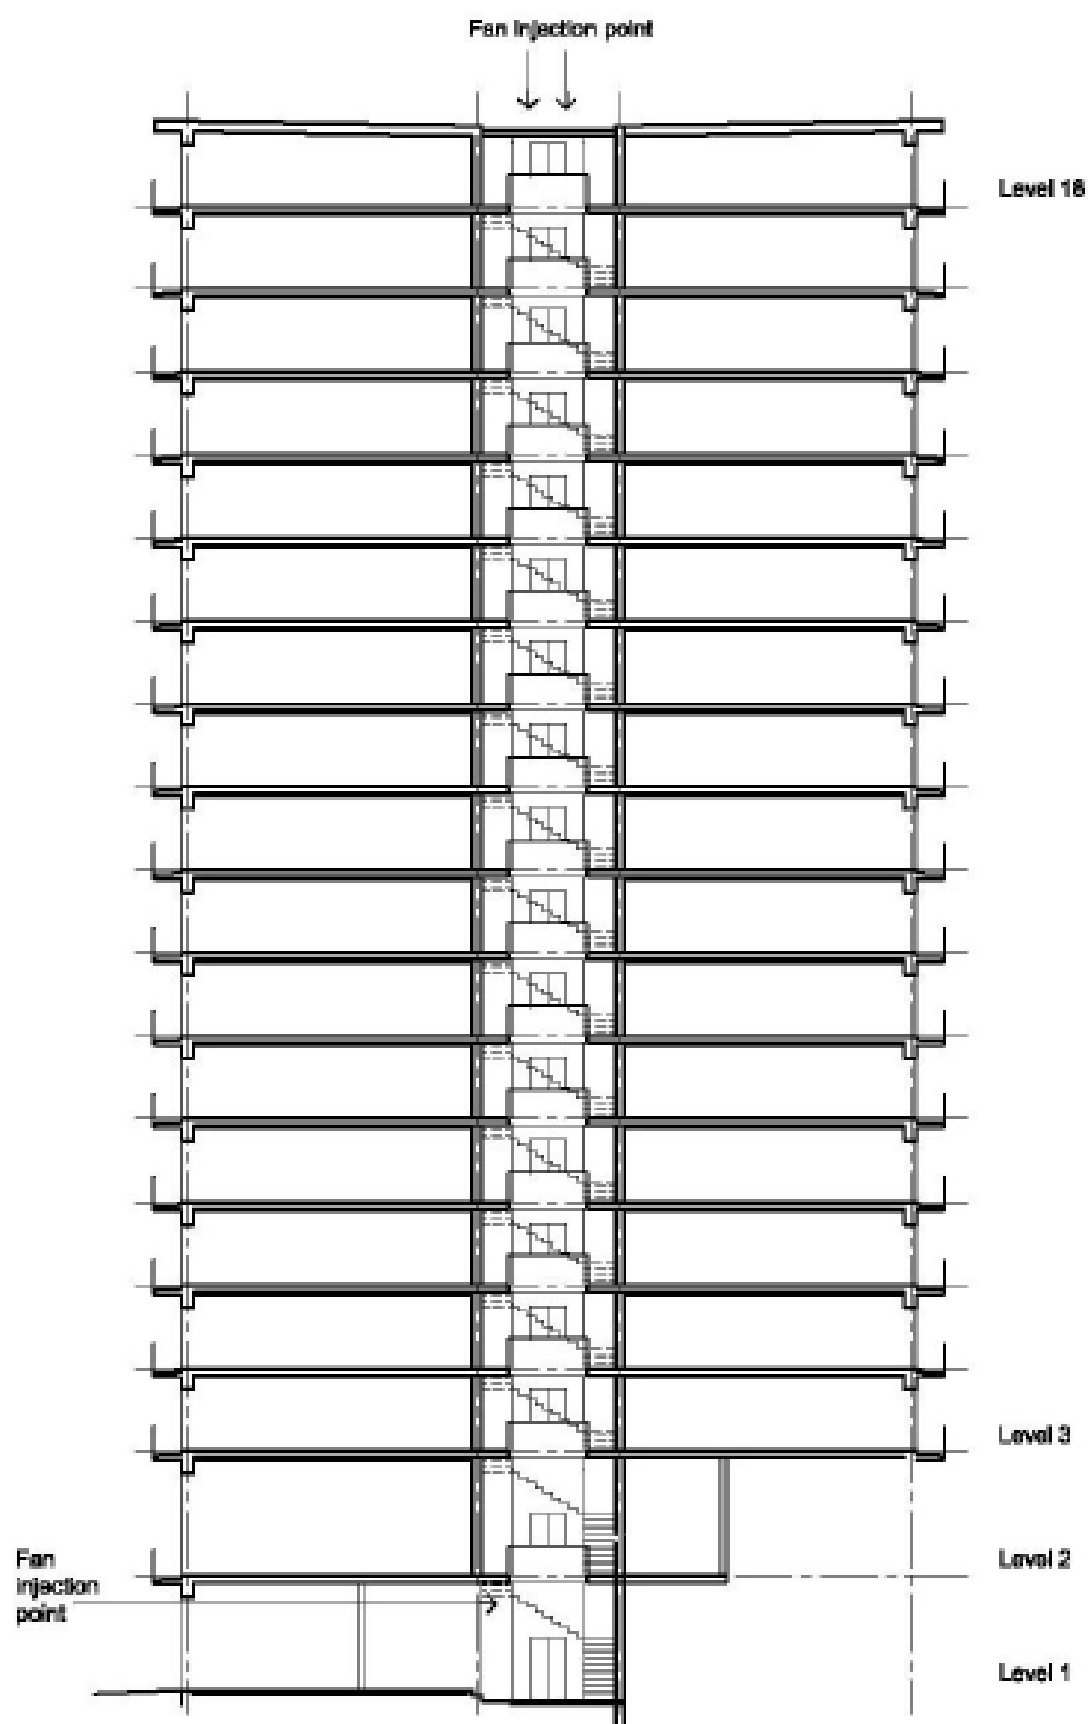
Elevation view of scenario 1 building (from DBH determination 2005-109^[6]).
